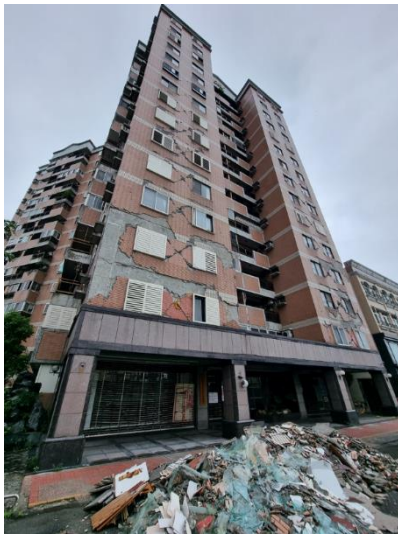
Damage in non-structural concrete façade panels and tiles.
